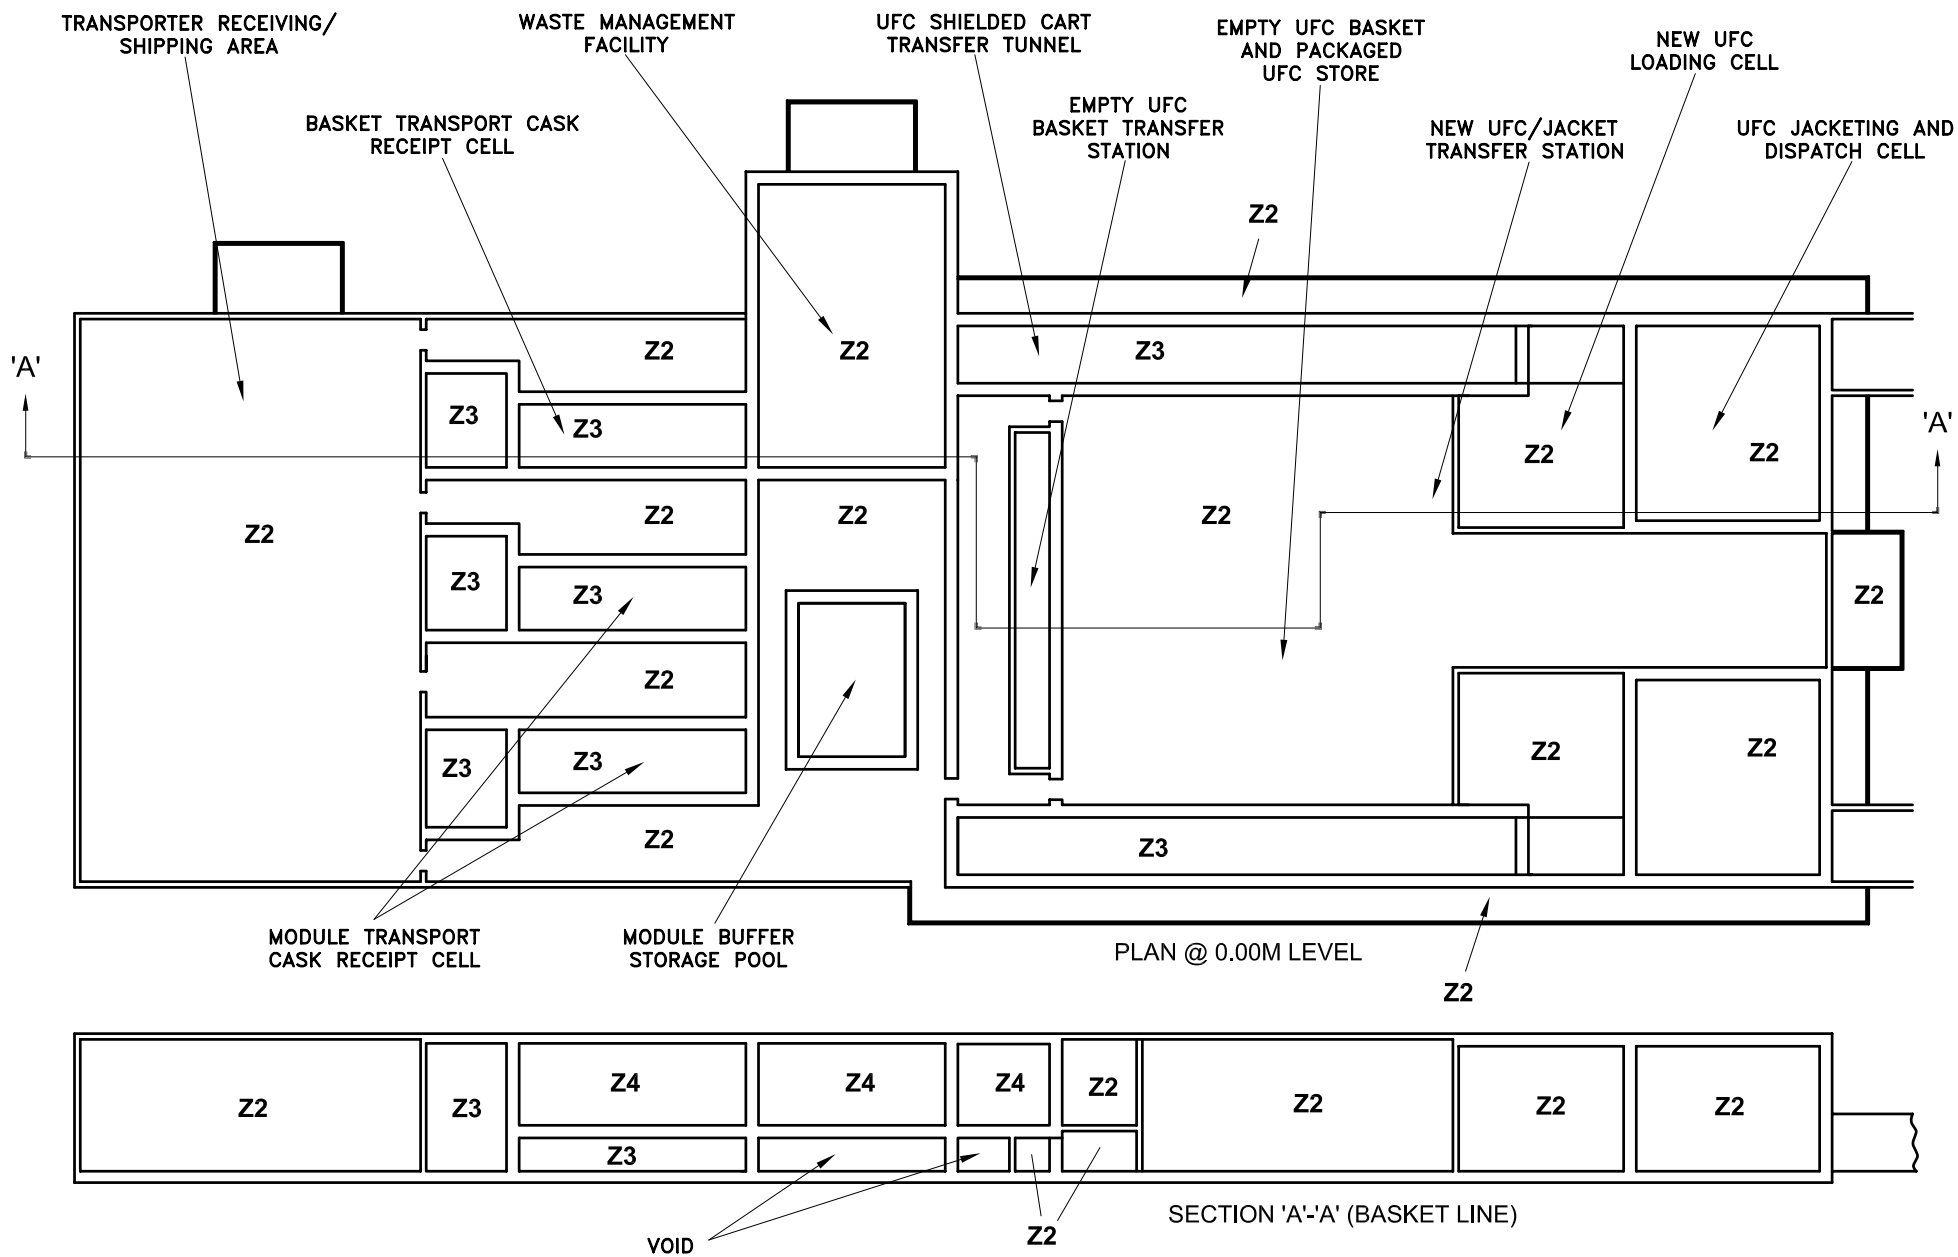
SIMPLIFIED PLAN AND ELEVATION OF THE USED FUEL PACKAGING PLANT
